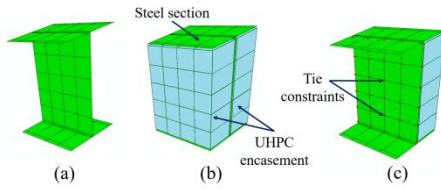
Finite element models for steel arch members: (a) steel section; (b) UHPC encased section; (c) tie constraints
